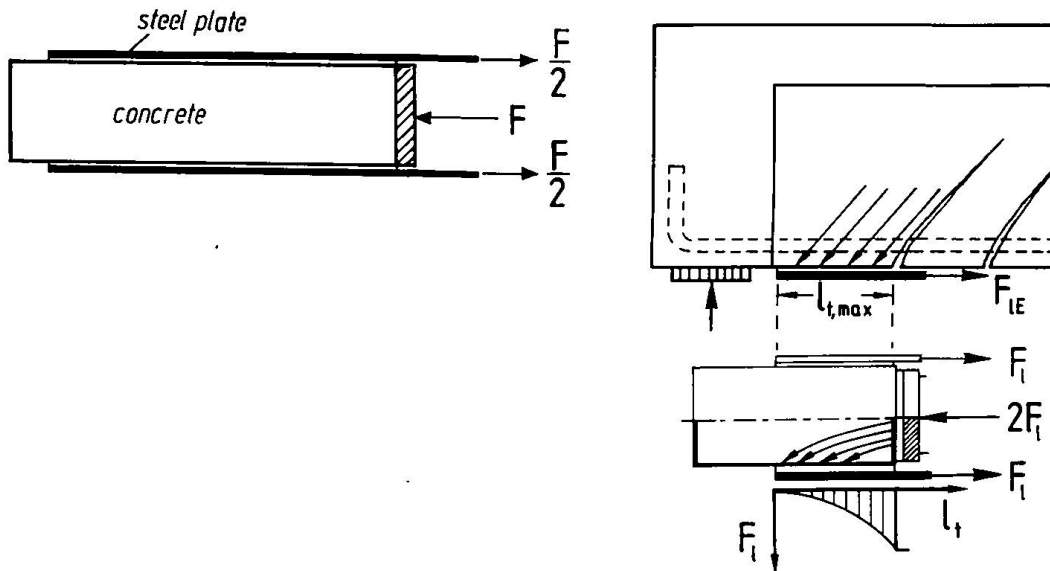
Double-lap test specimen (compression-tension), used by Bresson /5/ / (left), Plate anchorage and bond test set-up (right)
